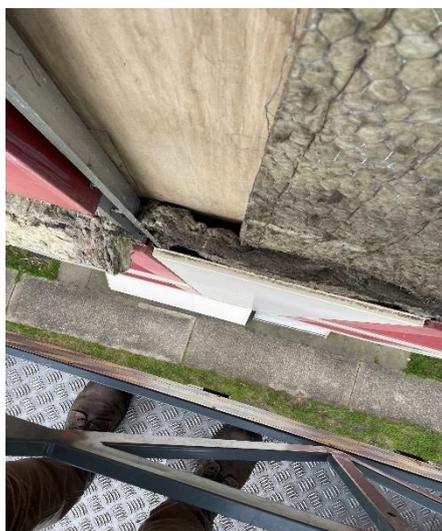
Concrete panel behind insulation exposed and trial hole drilled to test depth.
